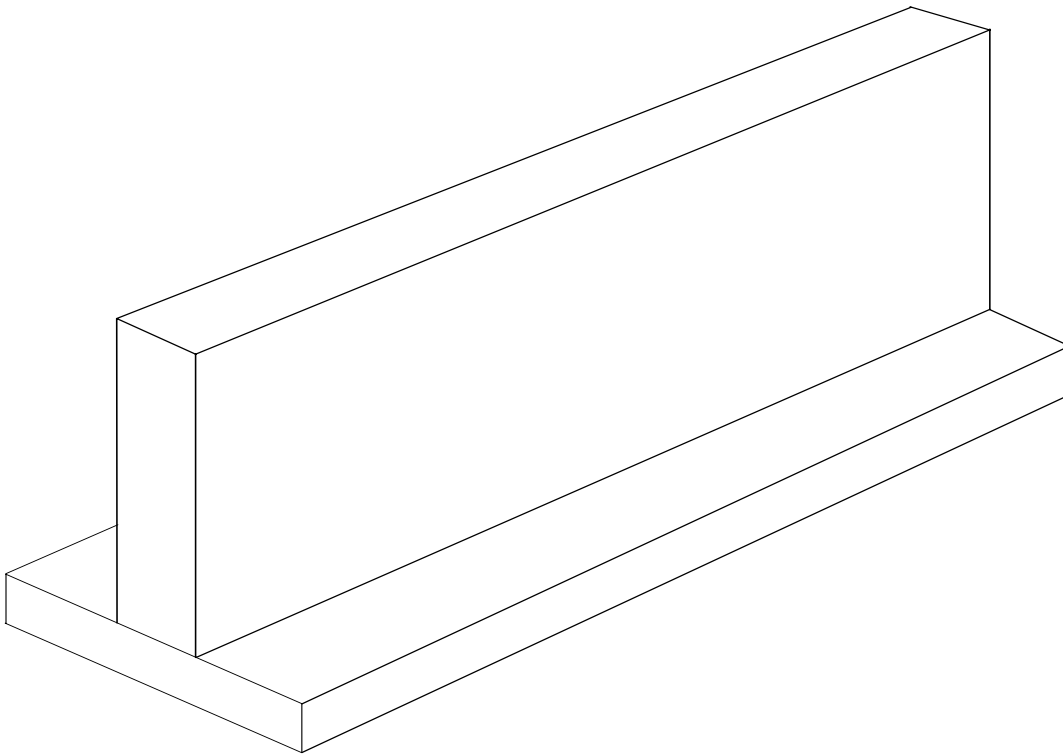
Continuous strip footing (FHWA, 2002c).
